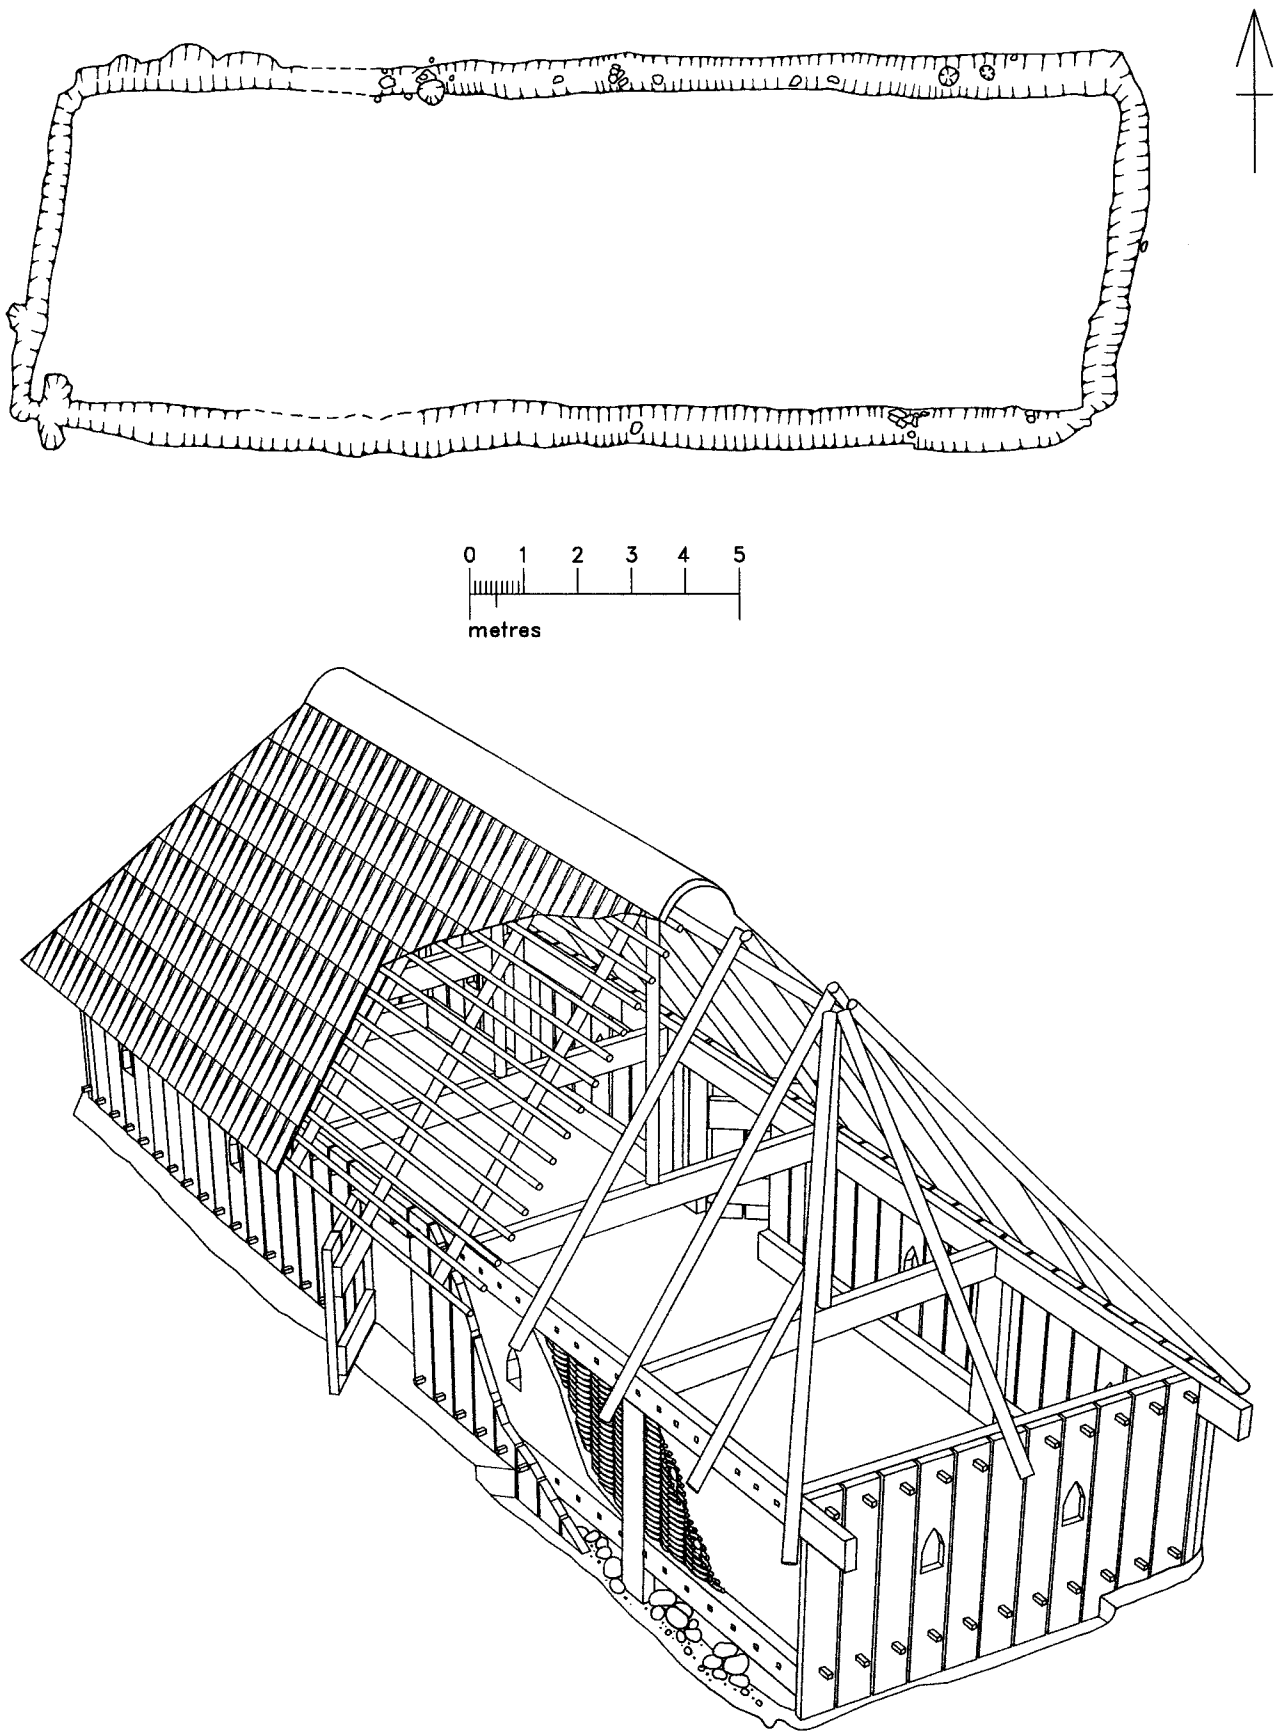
Possible reconstruction of Building 7 (tenth century), based on R. Darrah (M. Frankland).
